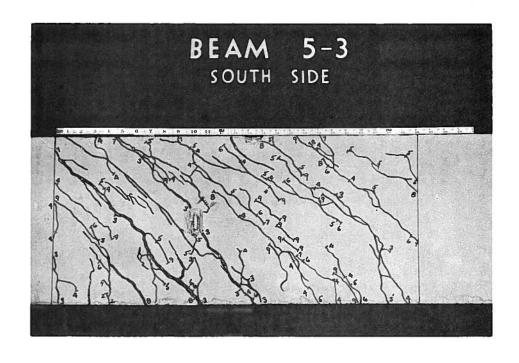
4 CRACK PATTERN OF BEAM 5 - 3
